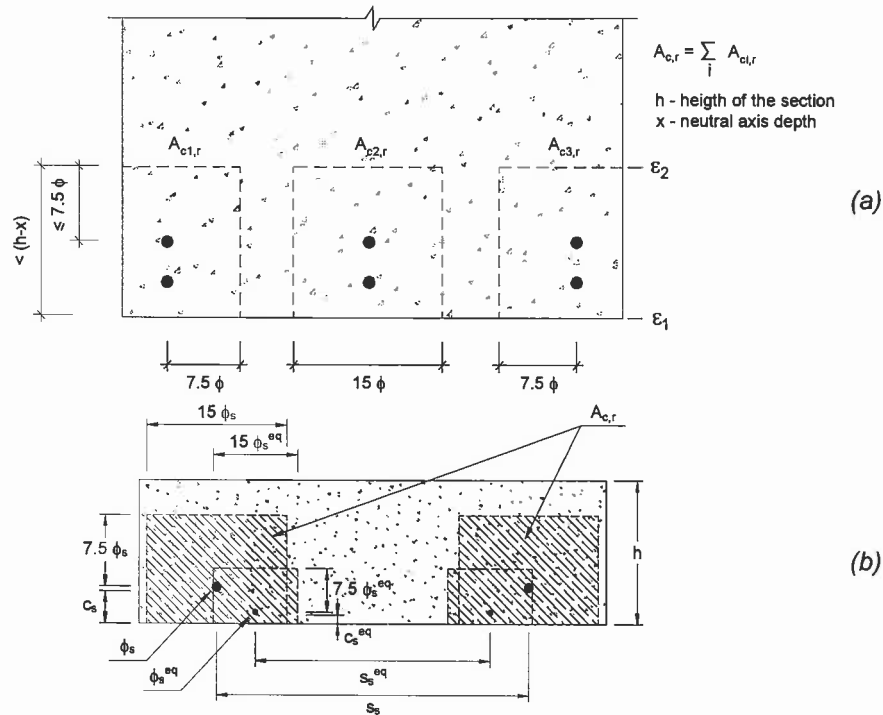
Effective surrounding concrete tension area: (a) REBAP (1983) and (b) adapted from REBAP for the strengthened slabs.
